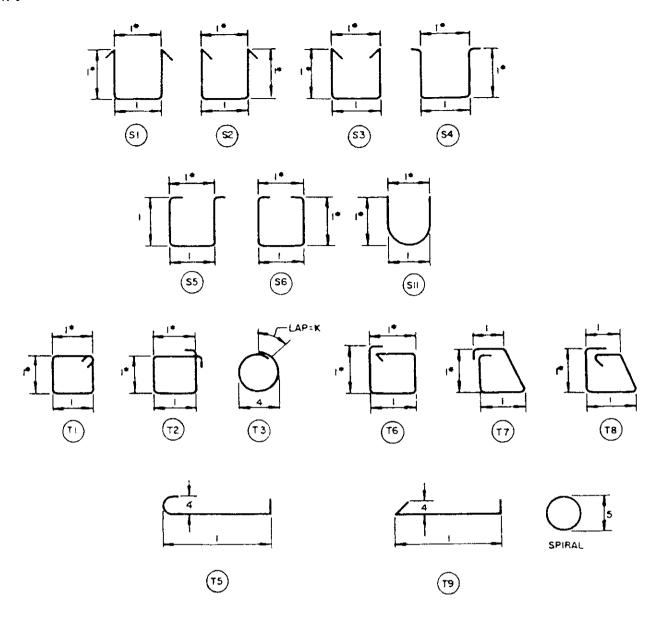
(a) — Standard fabricating tolerances for bar sizes #3 through #11
